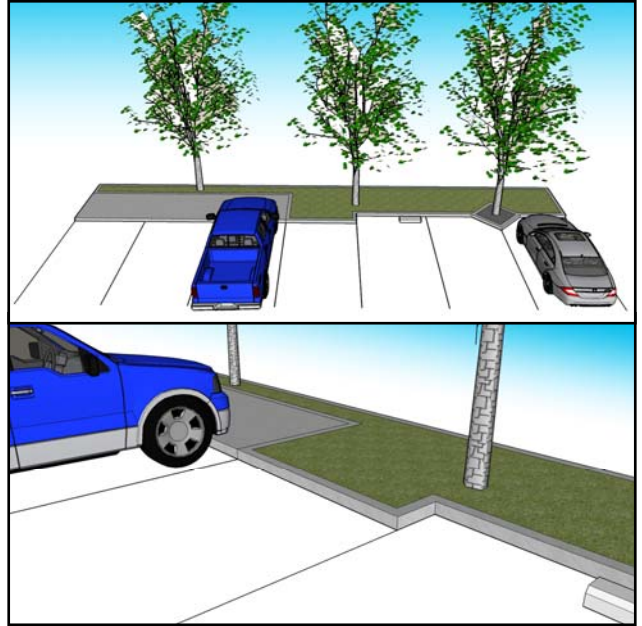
In median strips wider than 6 feet, 2 feet of that area may be counted as part of the parking stall. If the median is wider than 8 feet, 2.5 feet may be counted.
